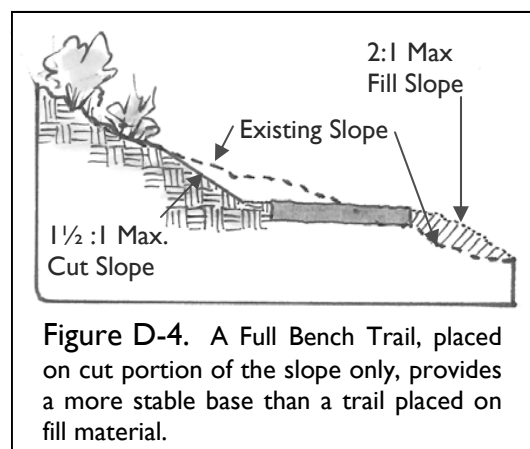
A Full Bench Trail, placed on cut portion of the slope only, provides a more stable base than a trail placed on fill material.
